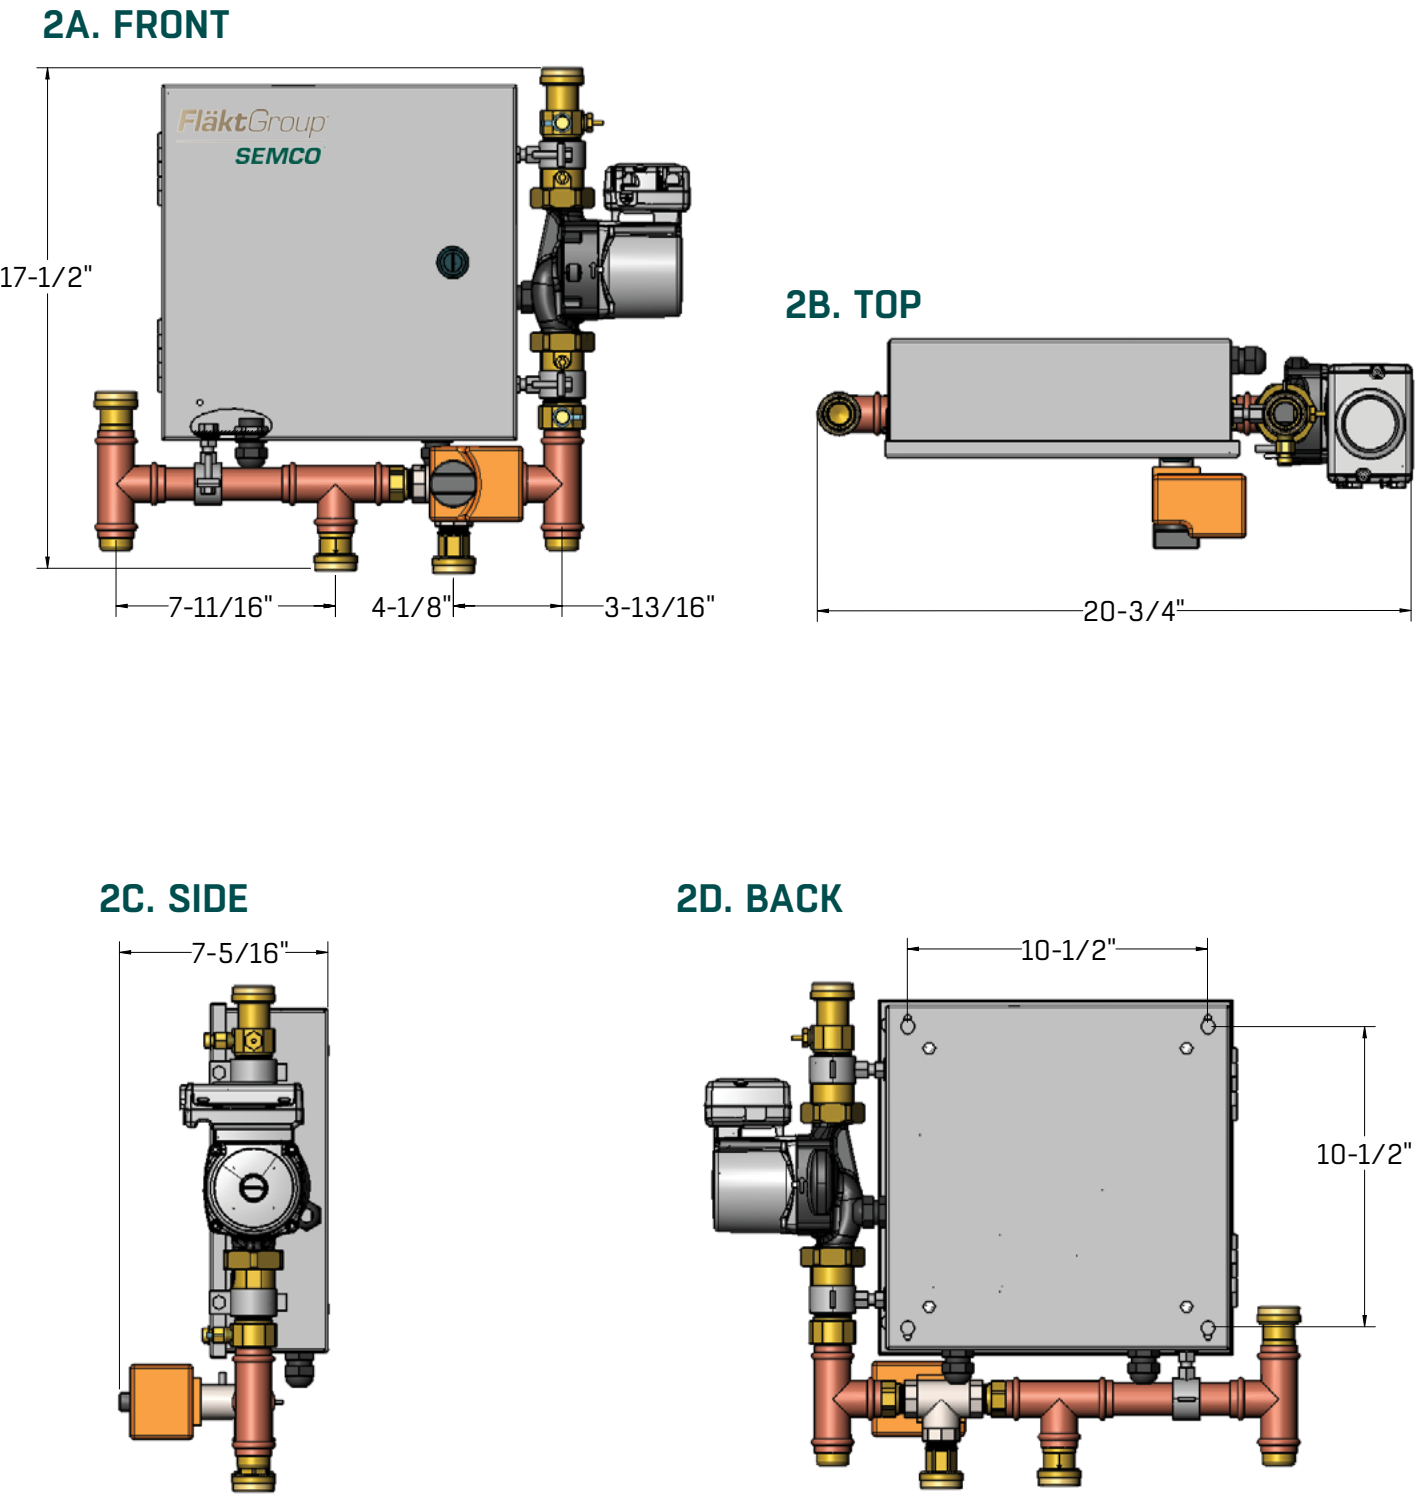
Dimensions of the NEUTON® Single Valve Pump Module from the front (A), top (B), side (C), and back (D).
